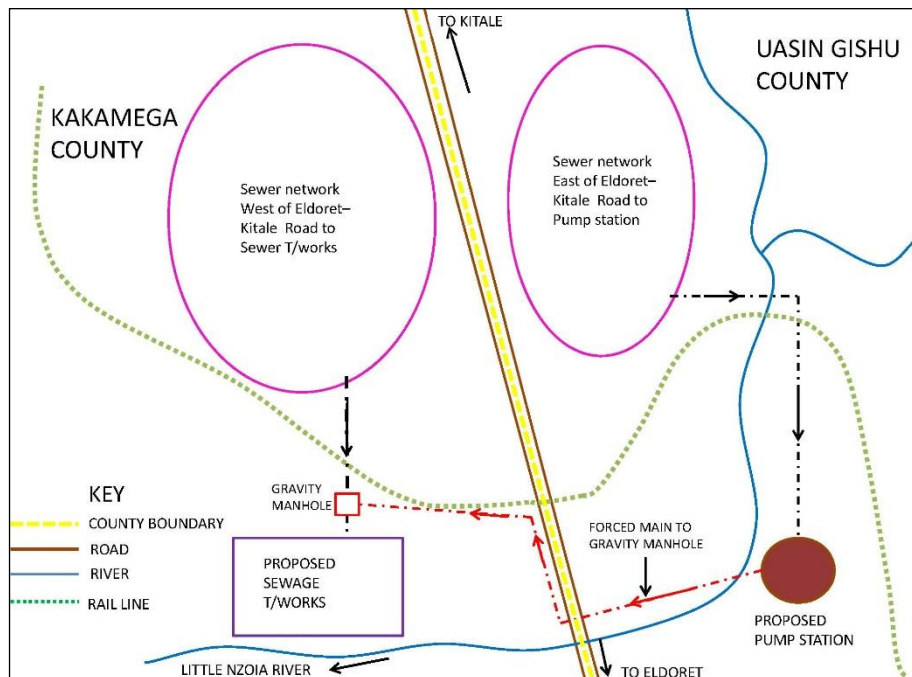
3: Schematic layout of the proposed Matunda Sewerage System
